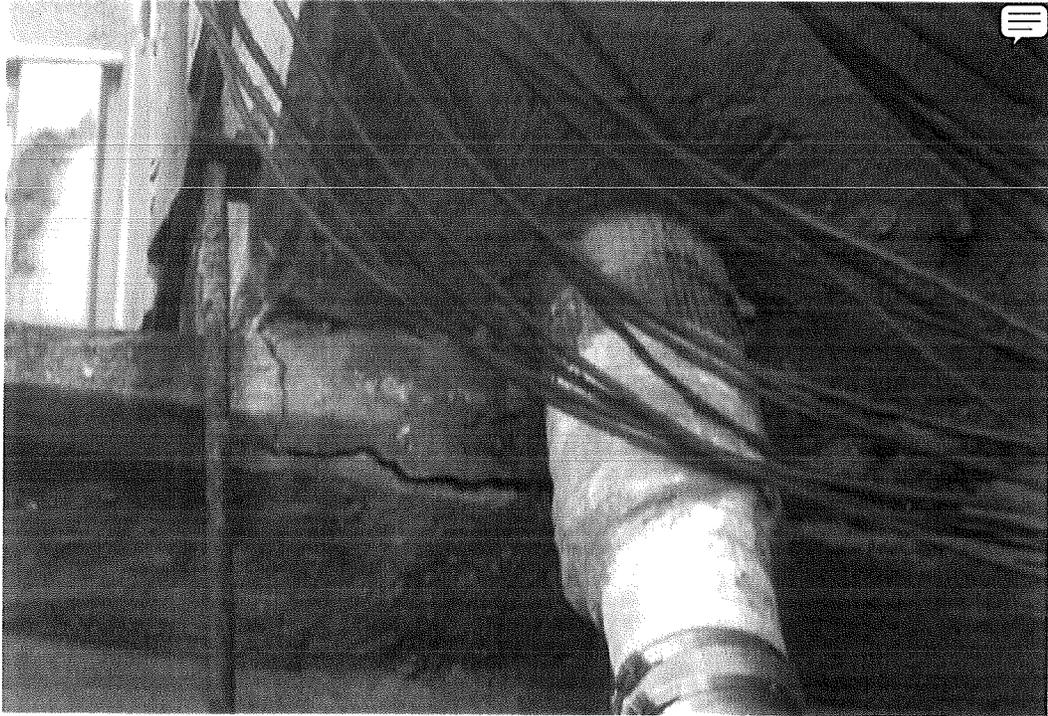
Cracked and hollow sounding concrete encasement. Underside of Parking Level 6, Along Column Line 3, between Column Lines U5 and U6. (Approx. 2.5 SF)
